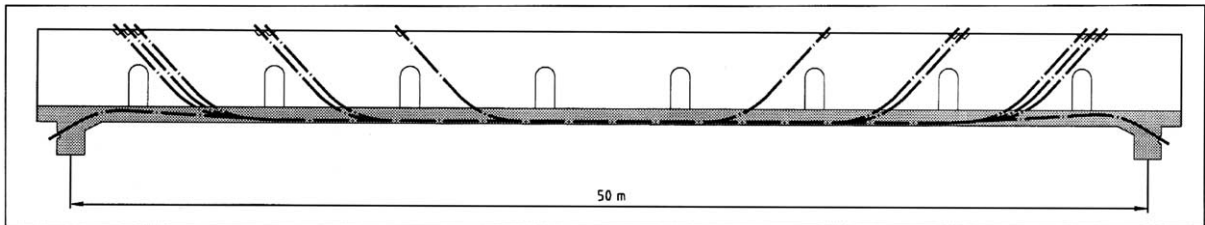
Prestressing tendon arrangement of the U-shaped girder.
